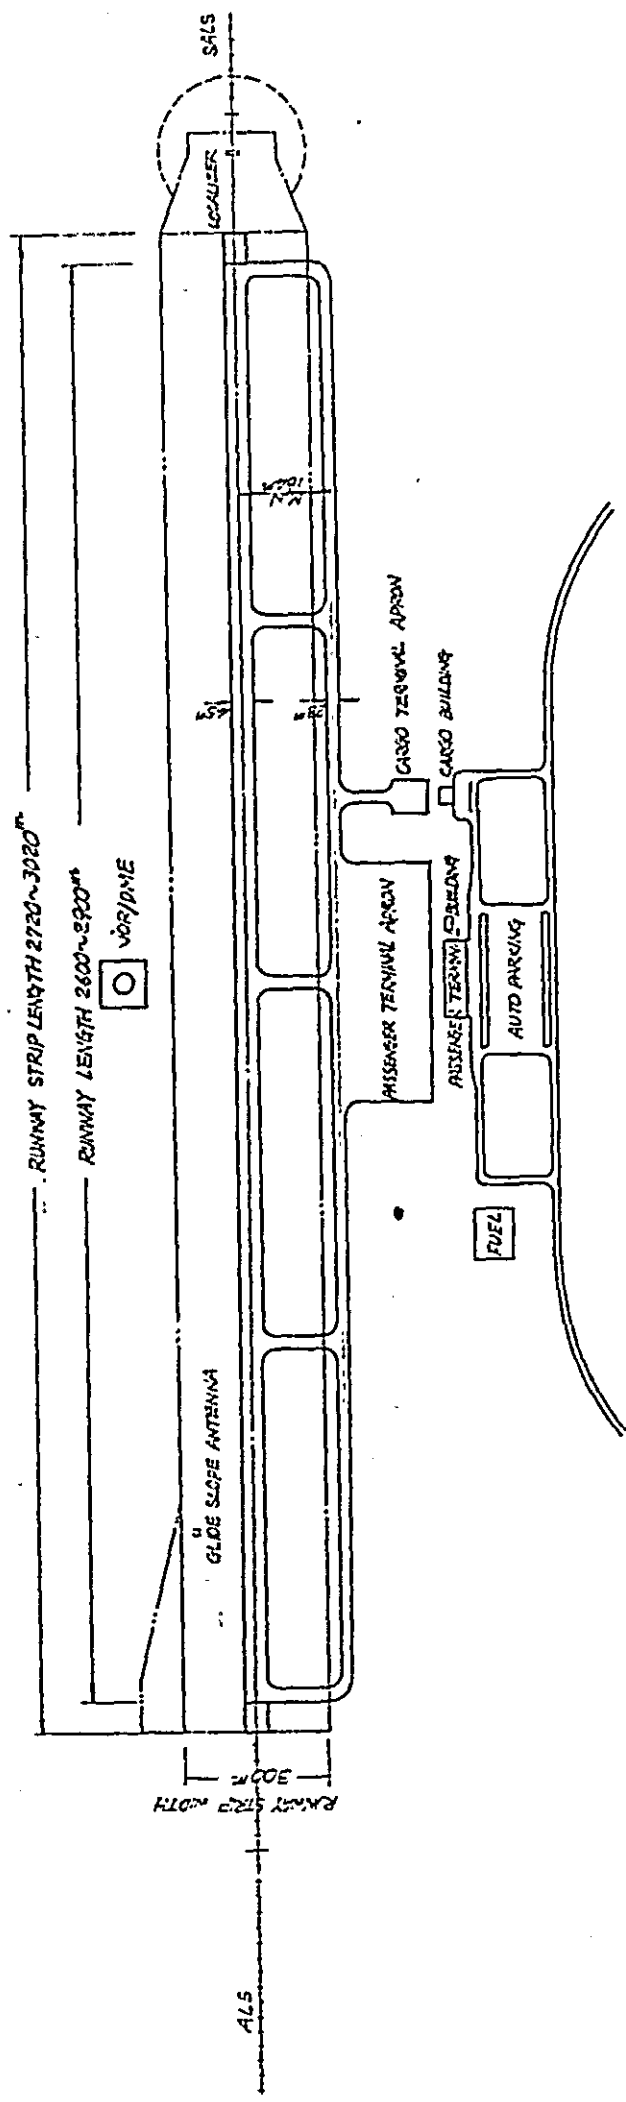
CONCEPTUAL LAYOUT PLAN
